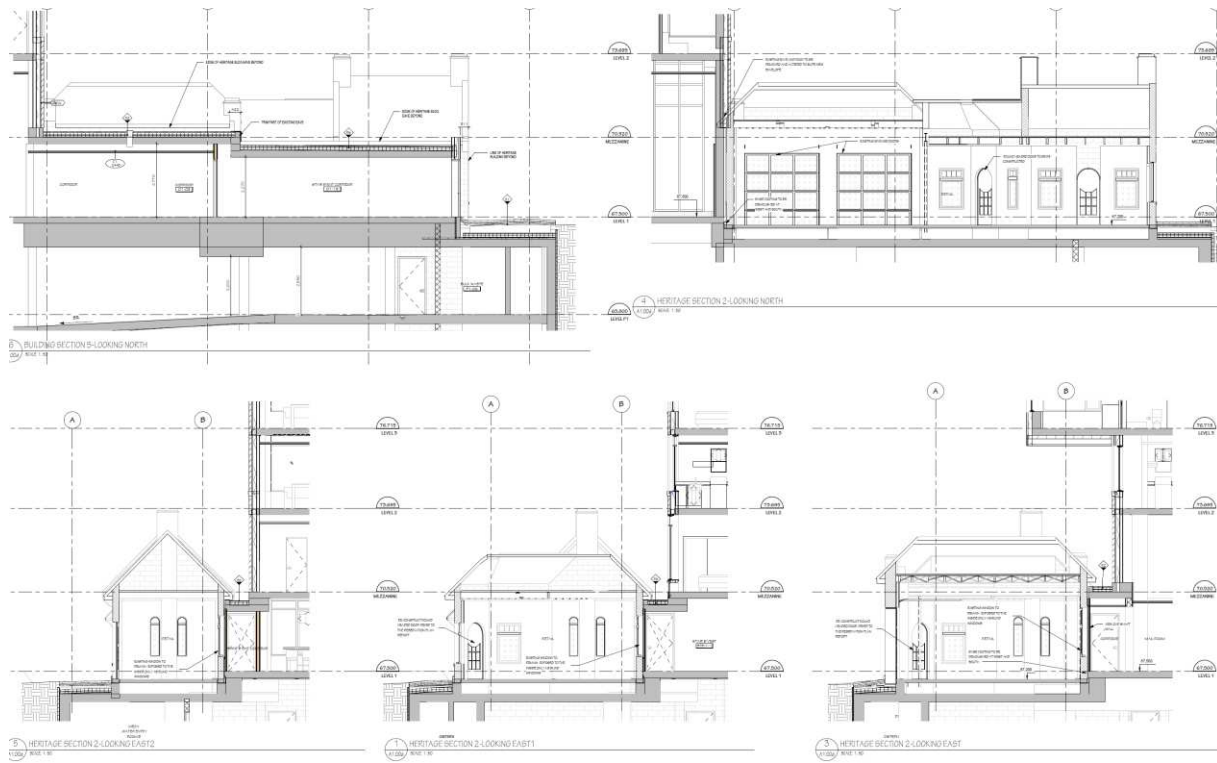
South Elevation: The flat roof linking the Service station to the development has been stepped to avoid damaging the stepped eaves. Source: Hobin Architecture 2023.
